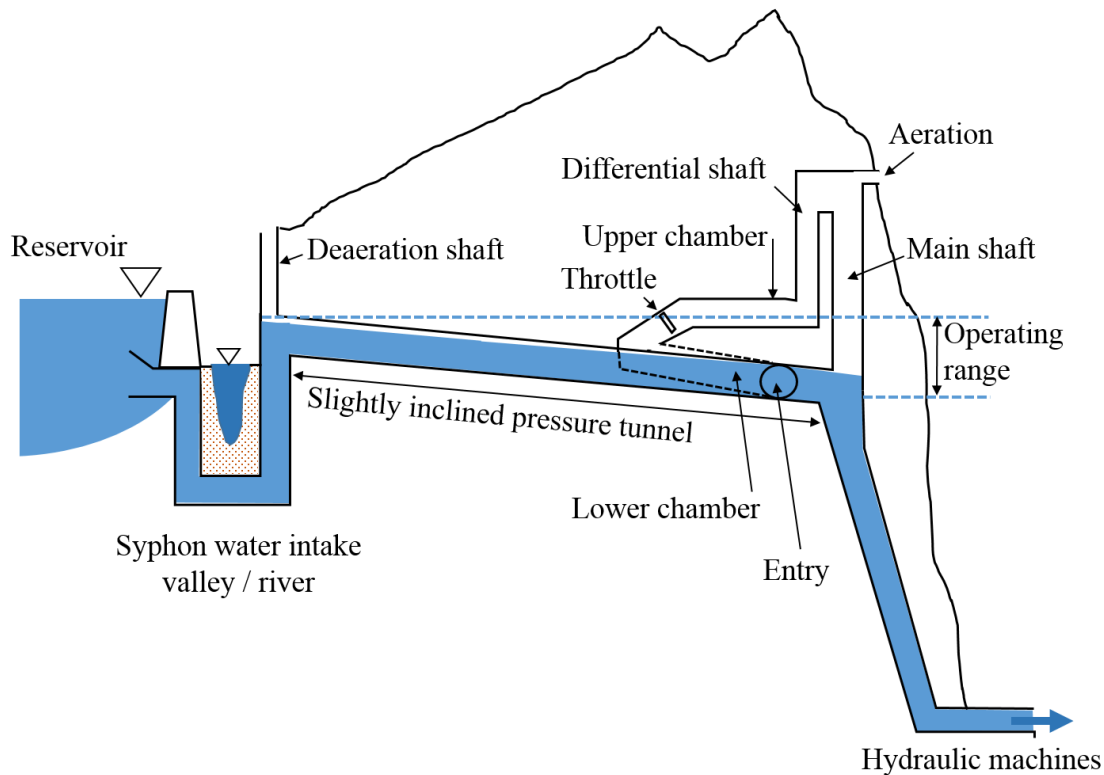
Schematic layout of a run-of-river power plant with storage-tunnel and storage-tunnel surge tank, siphon water intake design (Richter [191])
